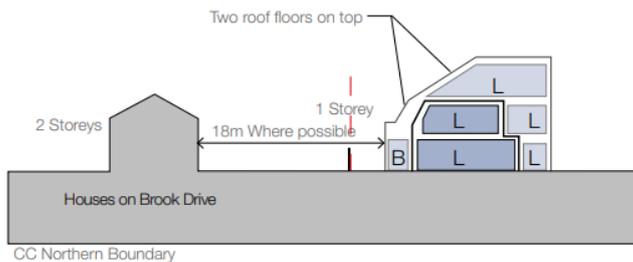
Partial first floor plan showing relationship with properties on Brook Drive.
